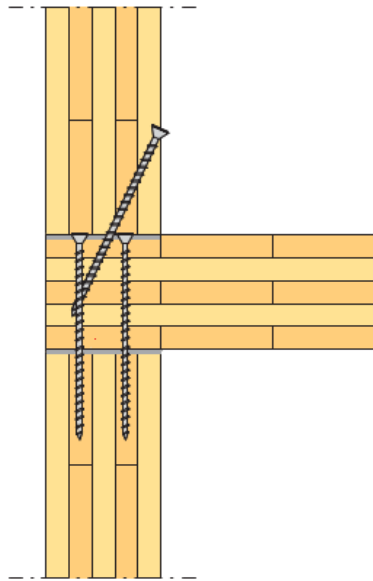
Screwed connection between a CLT wall and a CLT floor. (Swedish Wood, 2017).
